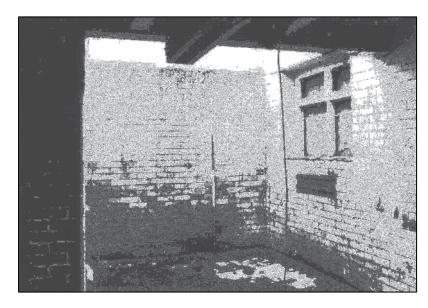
Building A, S part of GF, SW corner, looking S (photo 9/4).
